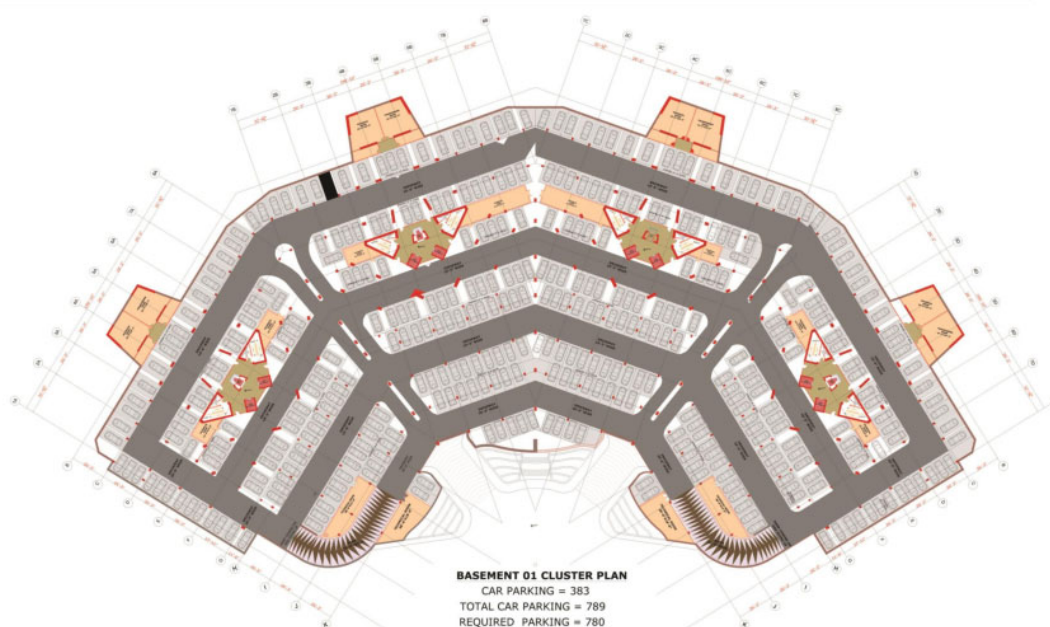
BASEMENT 01 FLOOR PLAN
